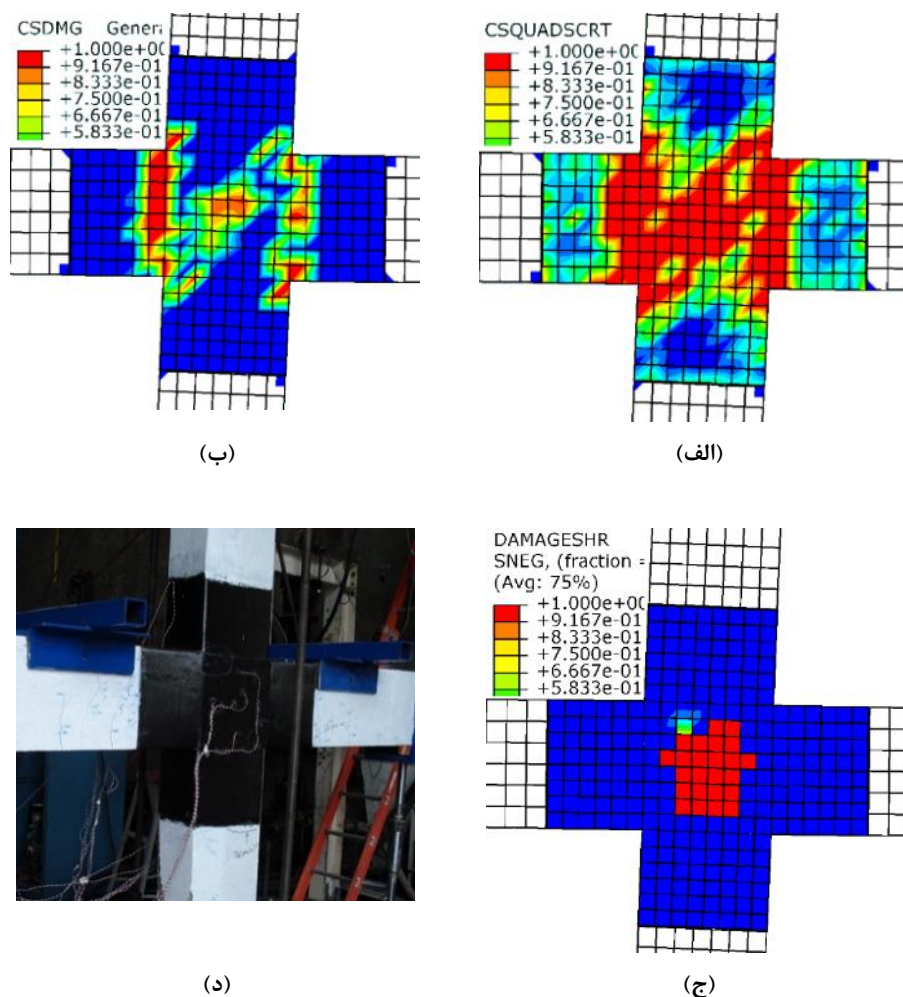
Concrete cracking of specimen AB-1
